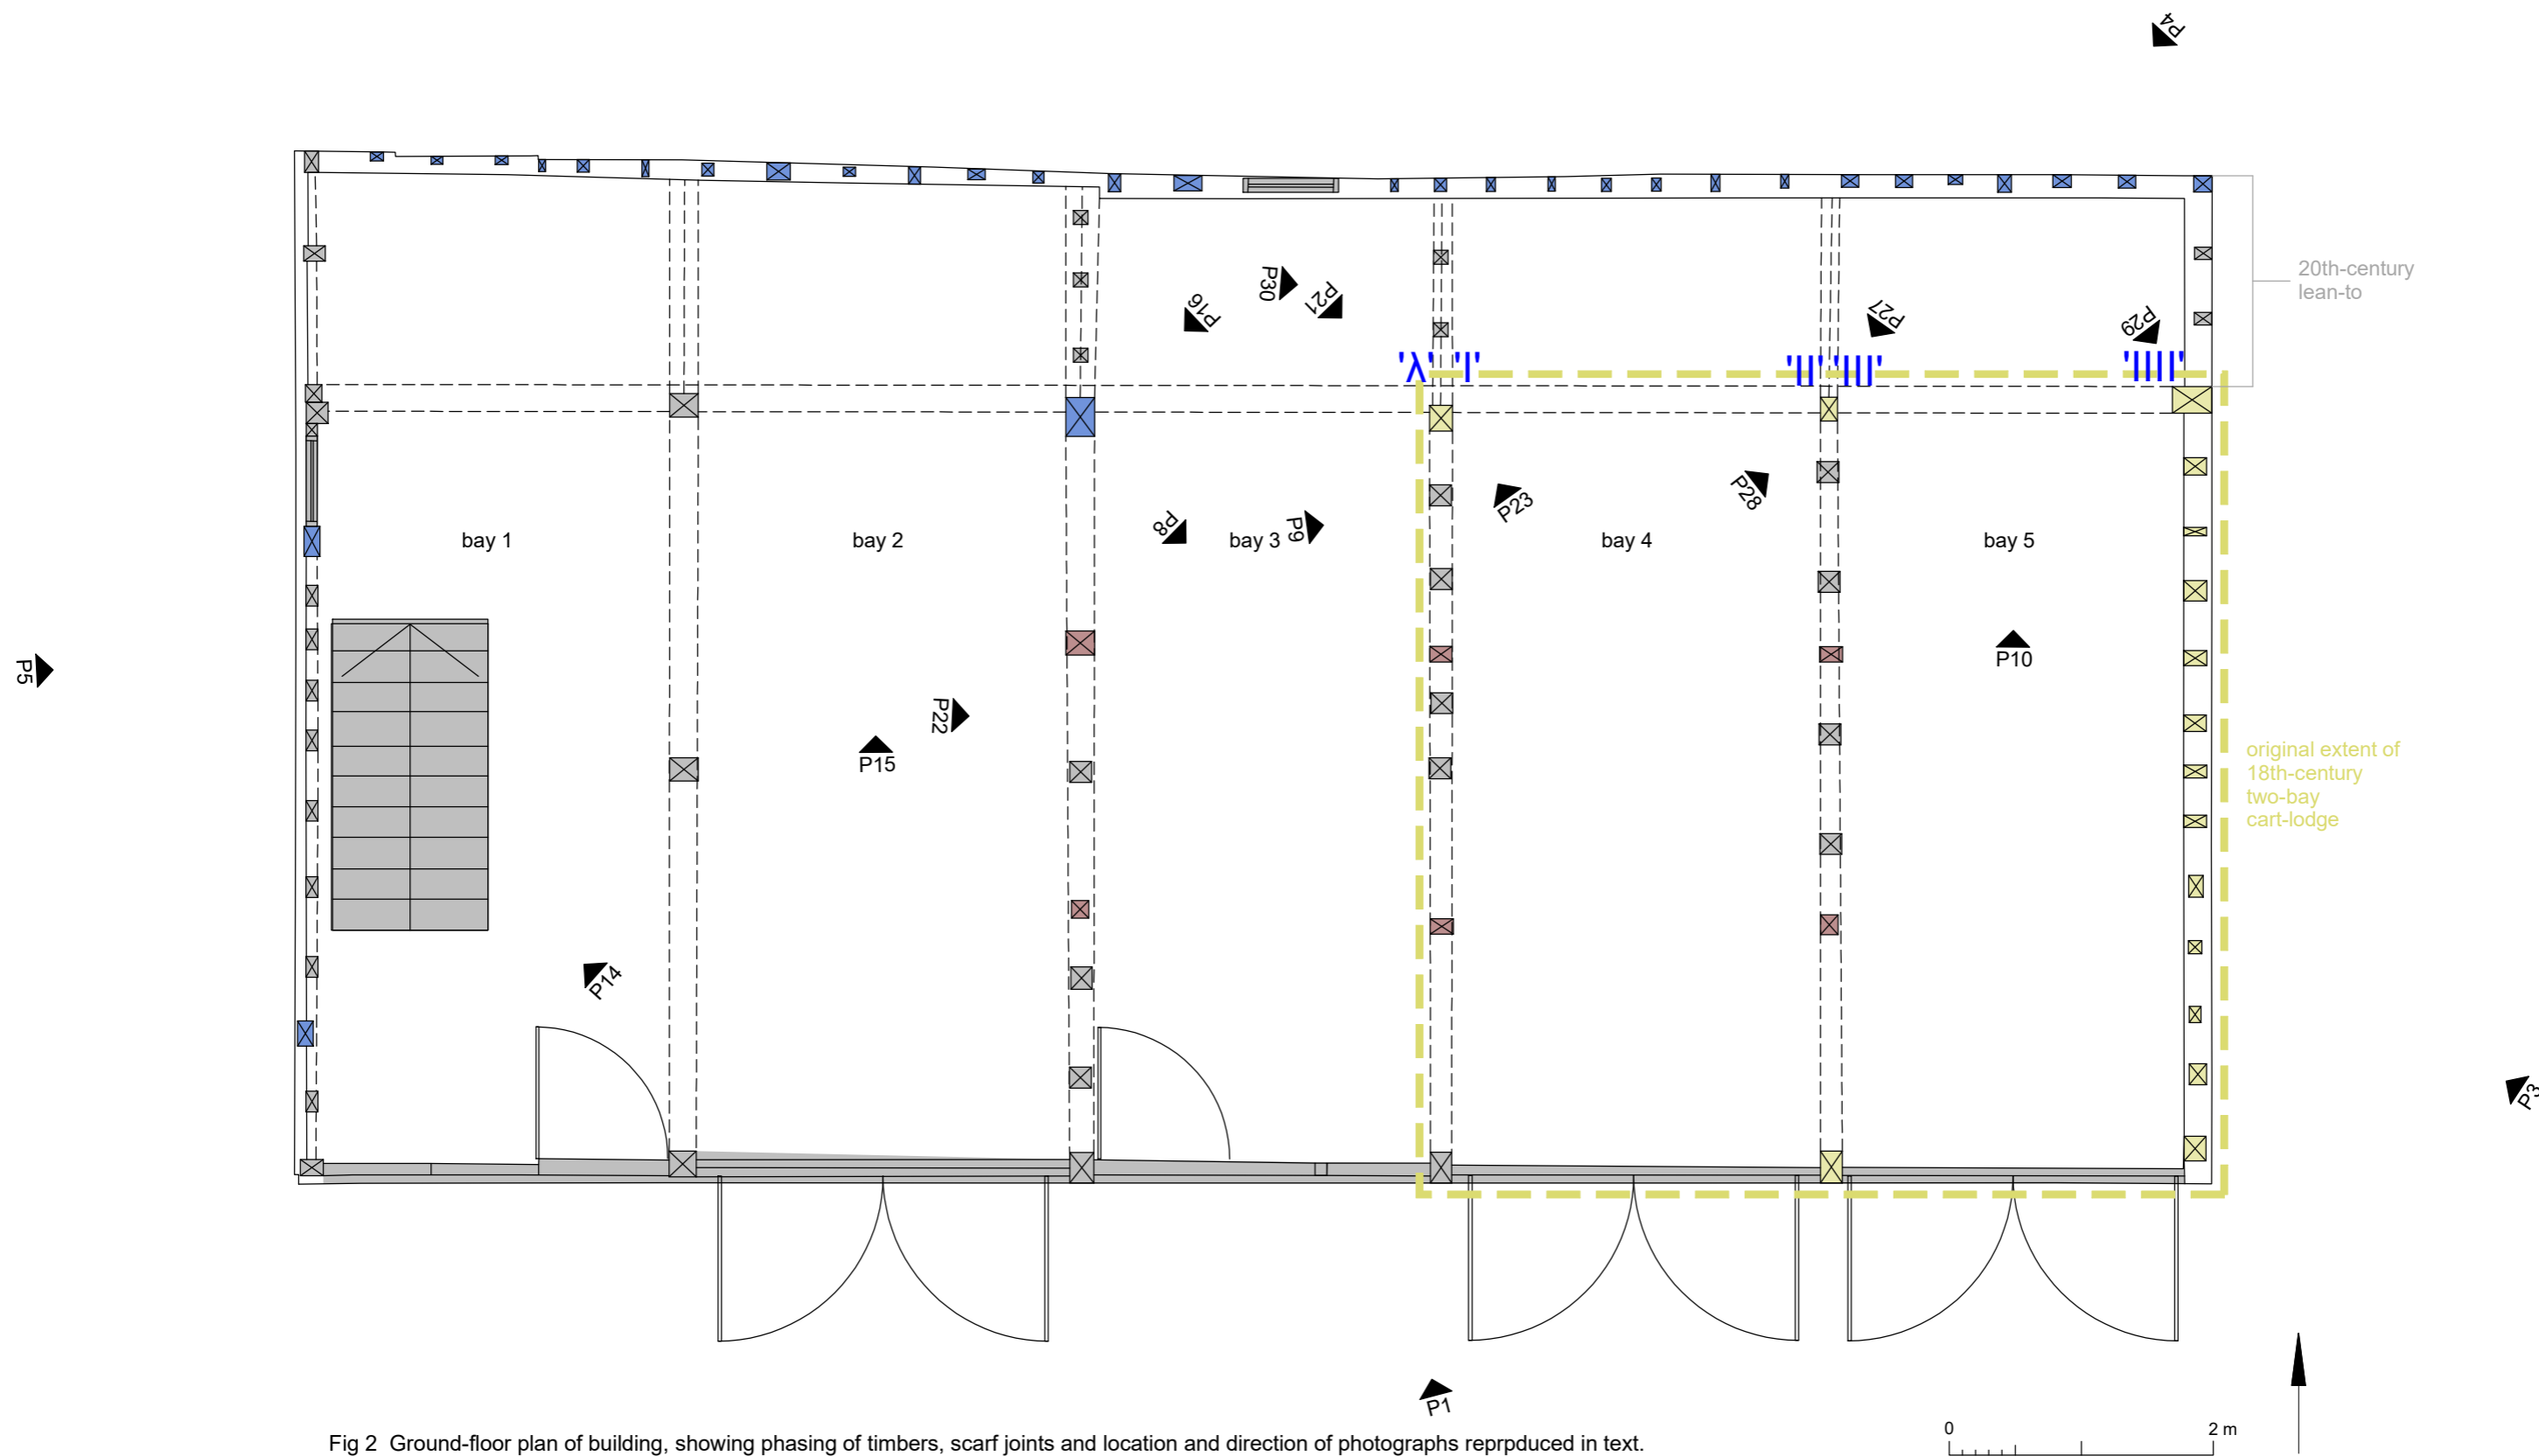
Ground-floor plan of building, showing phasing of timbers, scarf joints and location and direction of photographs reproduced in text.
